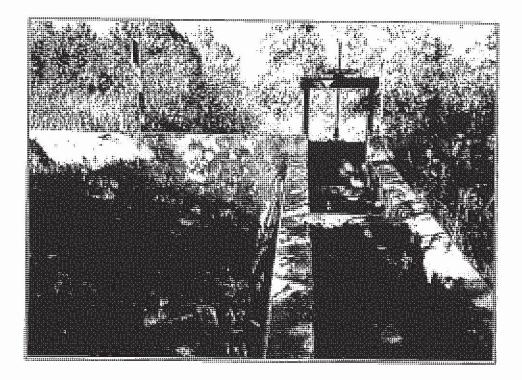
Bristol Mills Dam. East wall and fishway. Note crack on downstream face of east wall and vegetation of east abutment.
